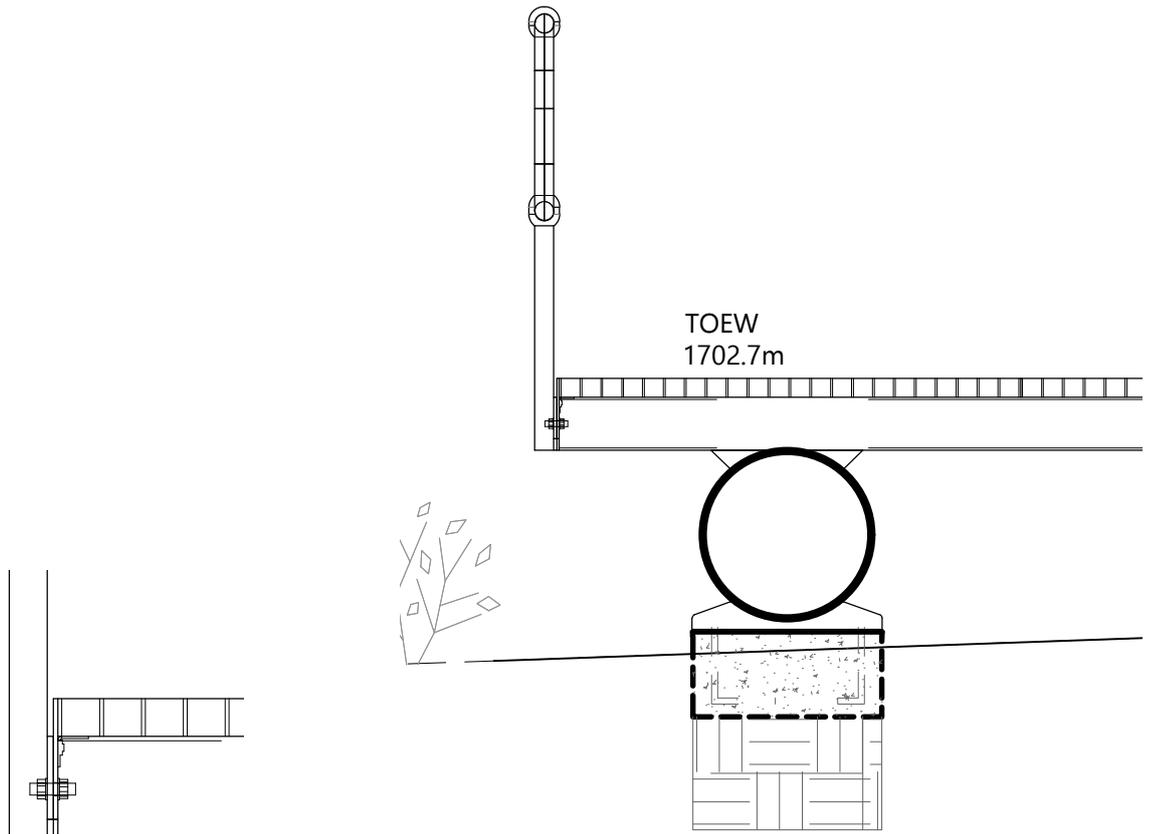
LED light strip fixed to walkway scale 1:10 (Author, 2017)
